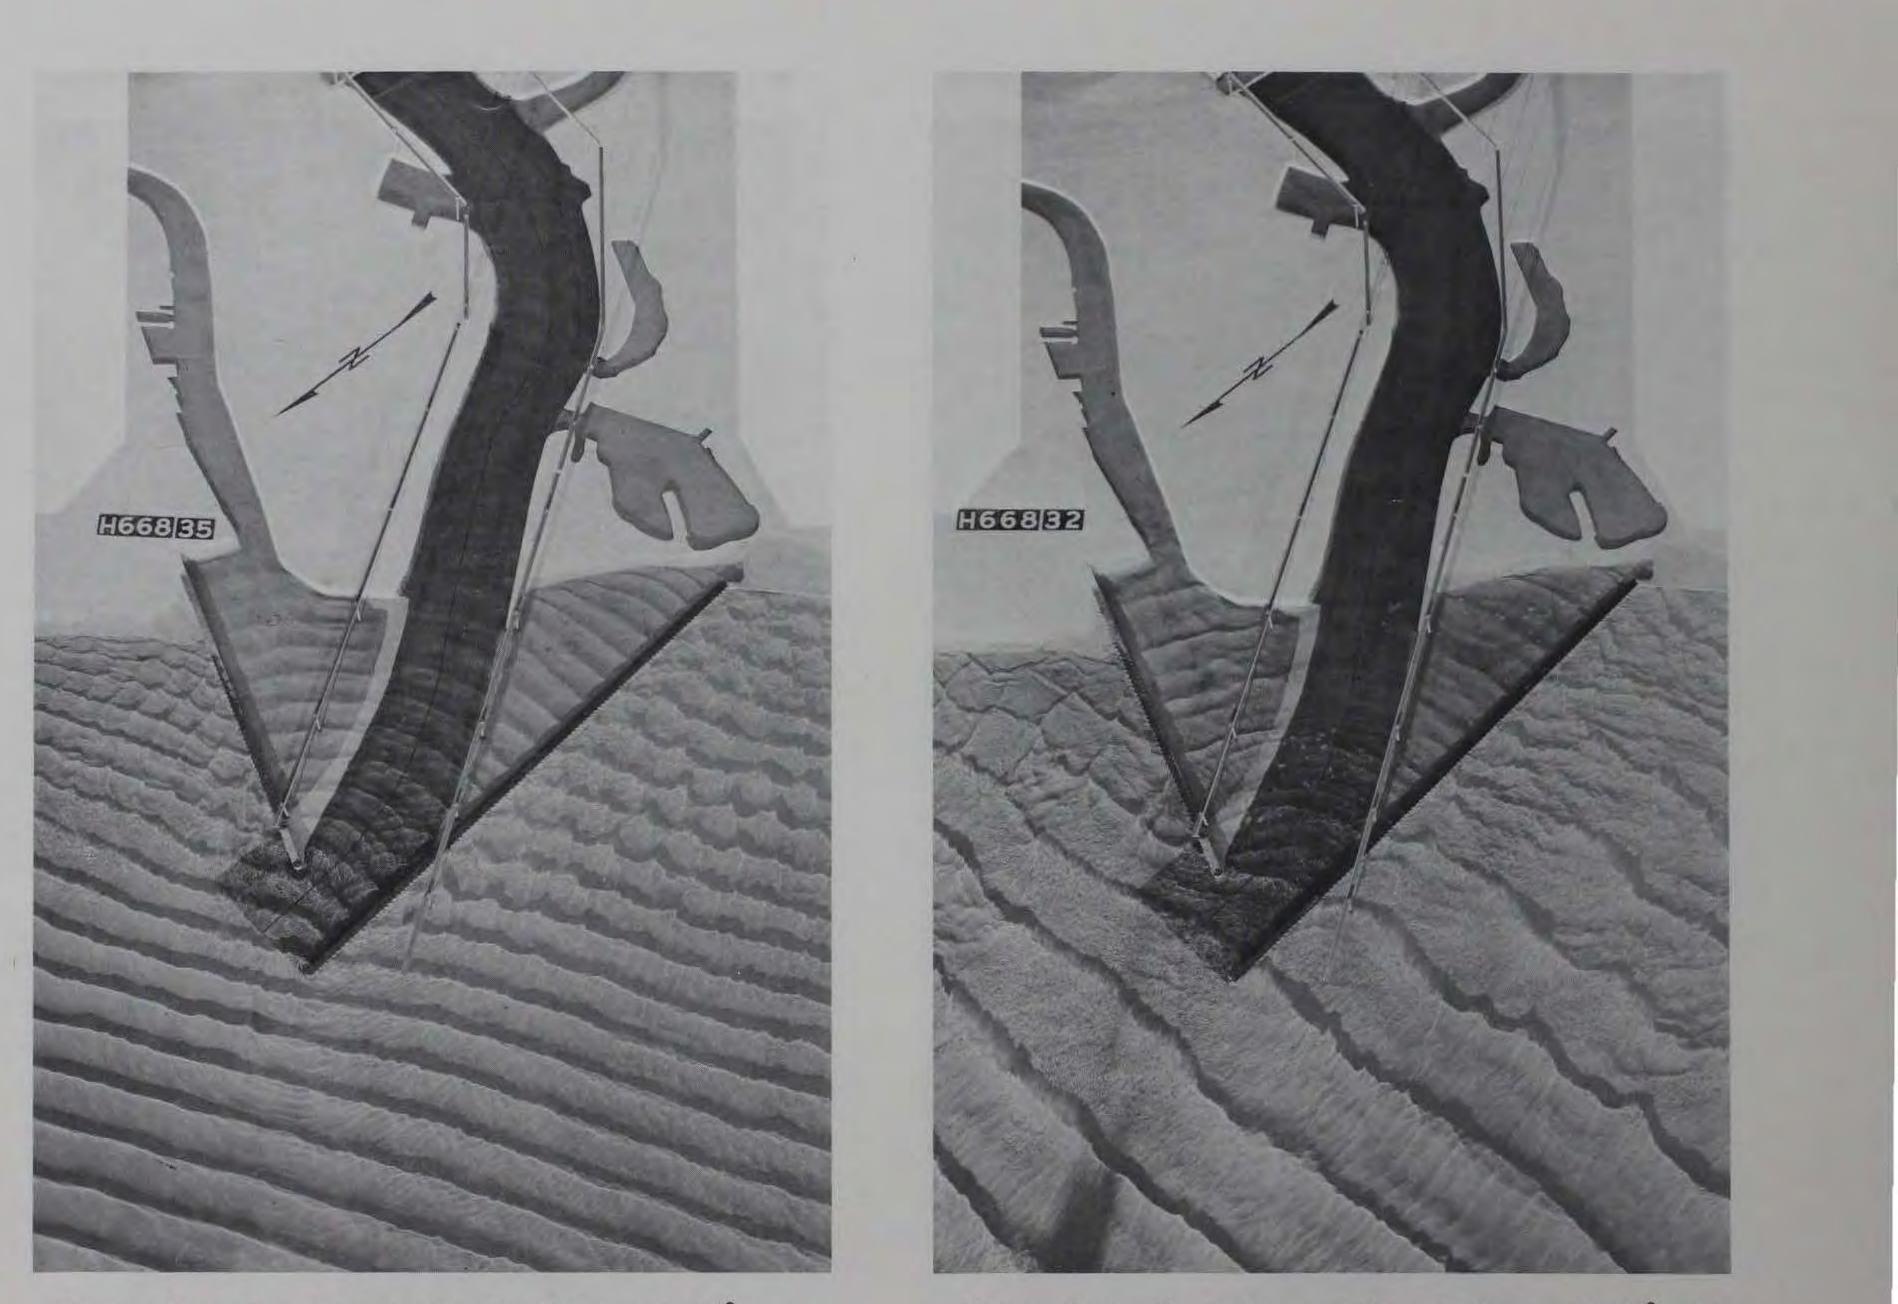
Plan 1; 5-sec, 7-ft waves from north 25° west
